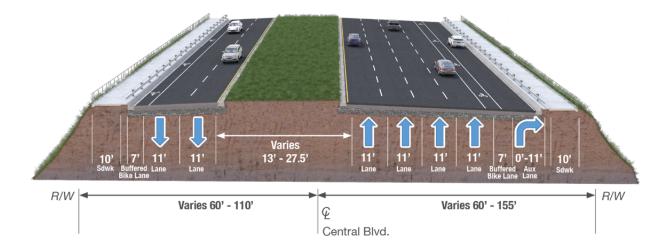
Proposed Typical Section - Central Blvd. West of I-95 - TDUI
